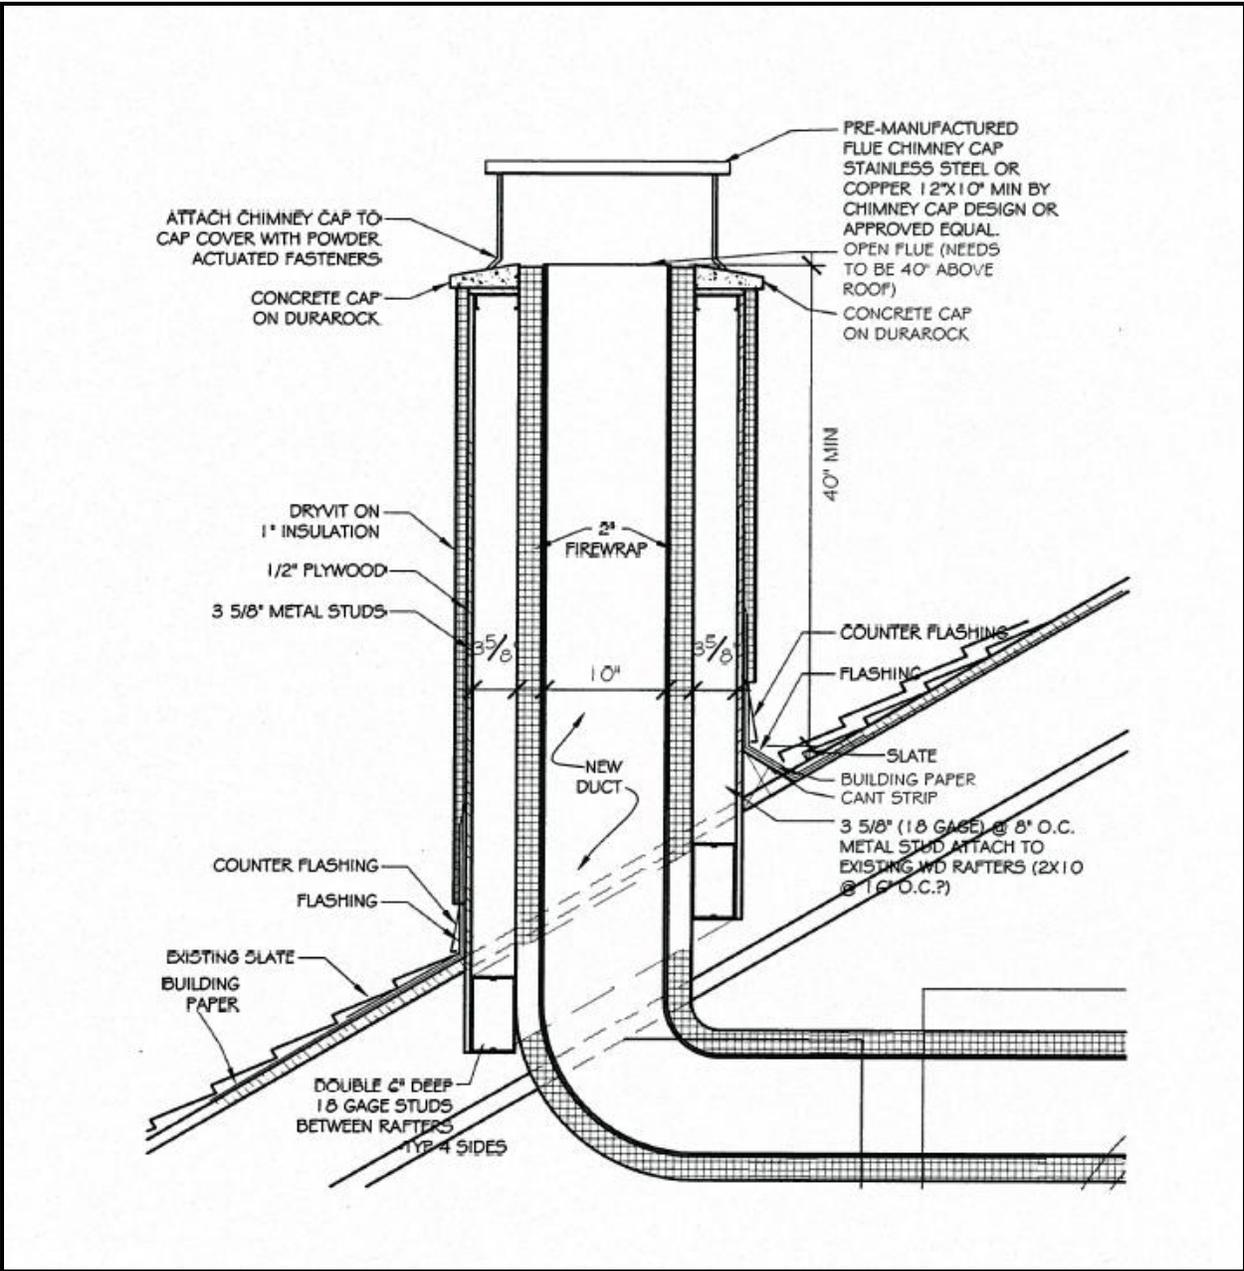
Detail Drawing Illustrating Exhaust Duct Cover/Chimney
